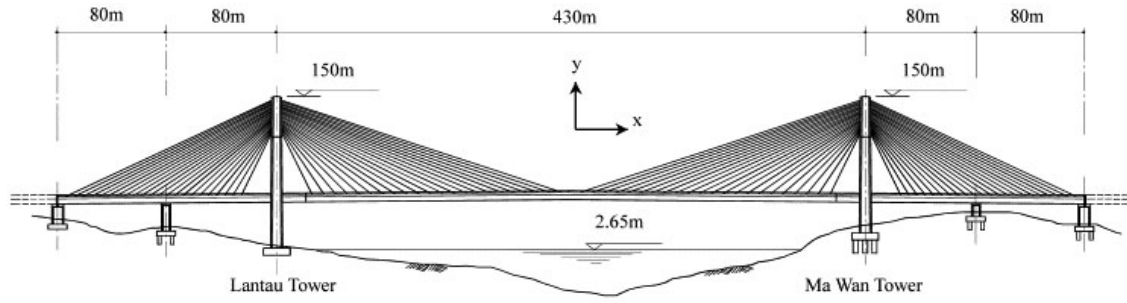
Elevation of Kap Shui Mun Bridge, studied by Ko et al. (2002).
